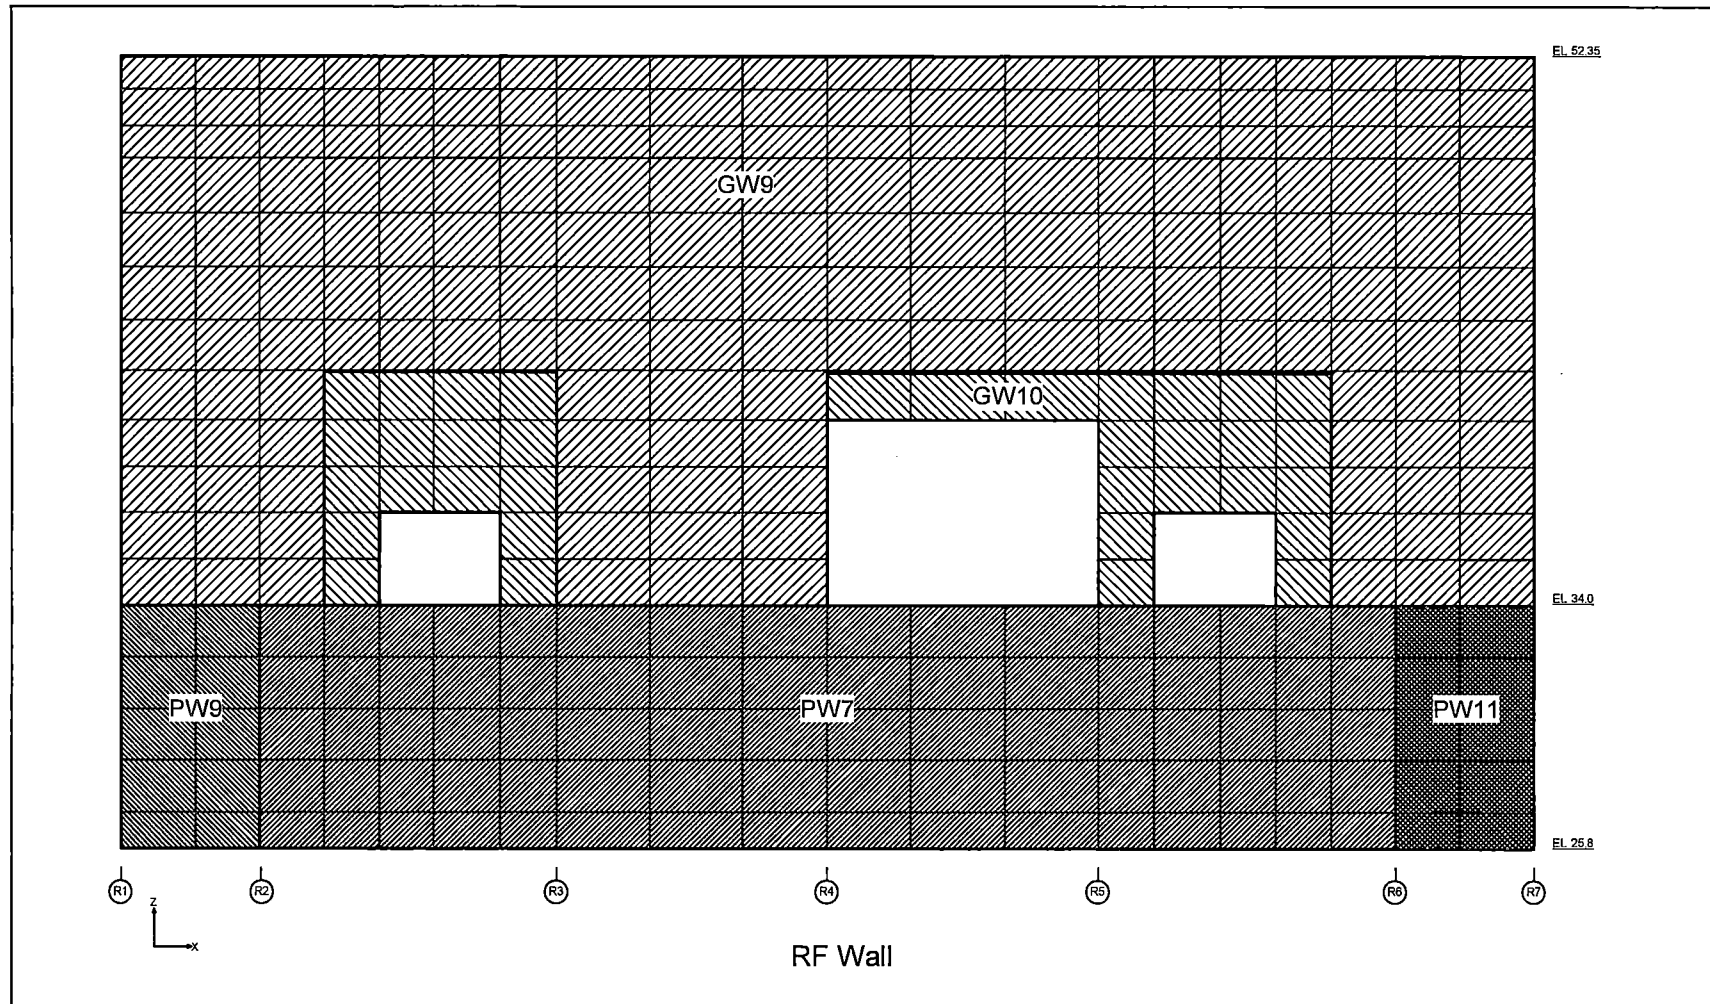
Application of Thermal Load on the External Wall (RF)
